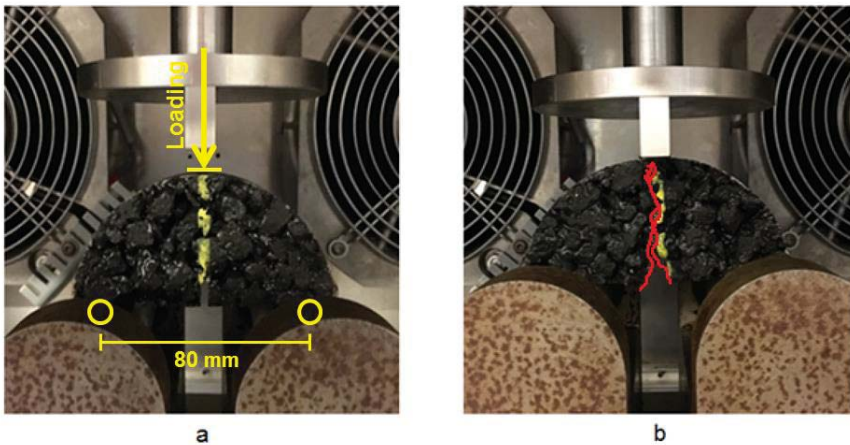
(a) SCB tests setup and (b) Fractured specimen after test.
